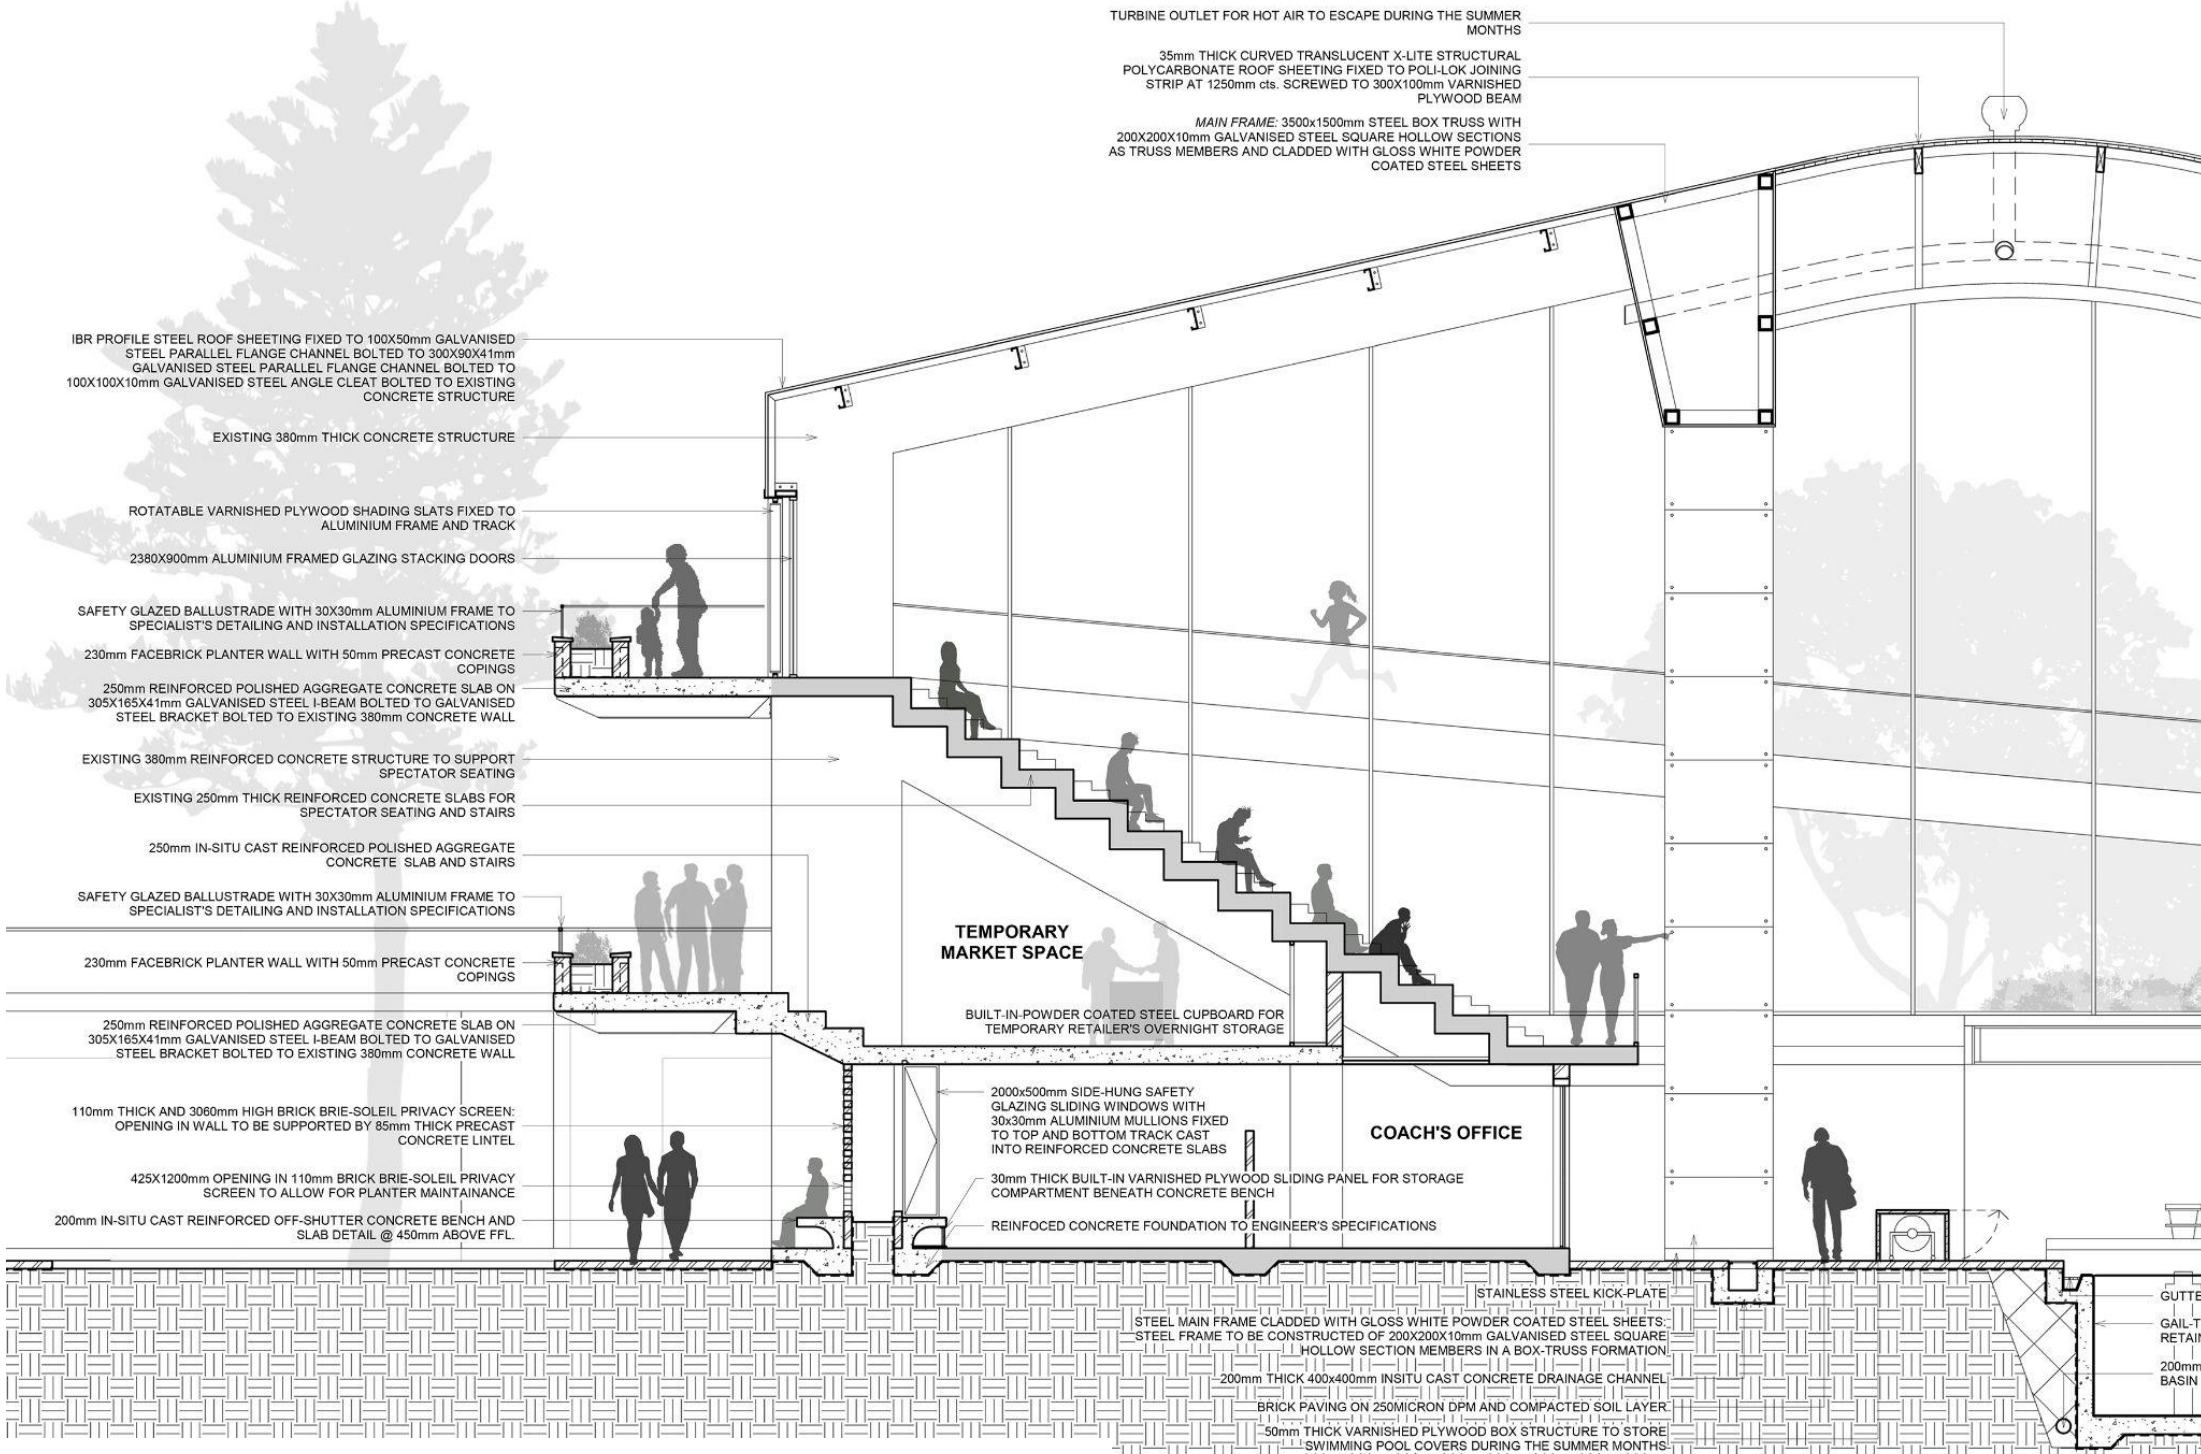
Callout of area on section where language 2 was expressed (Author, 2021)
